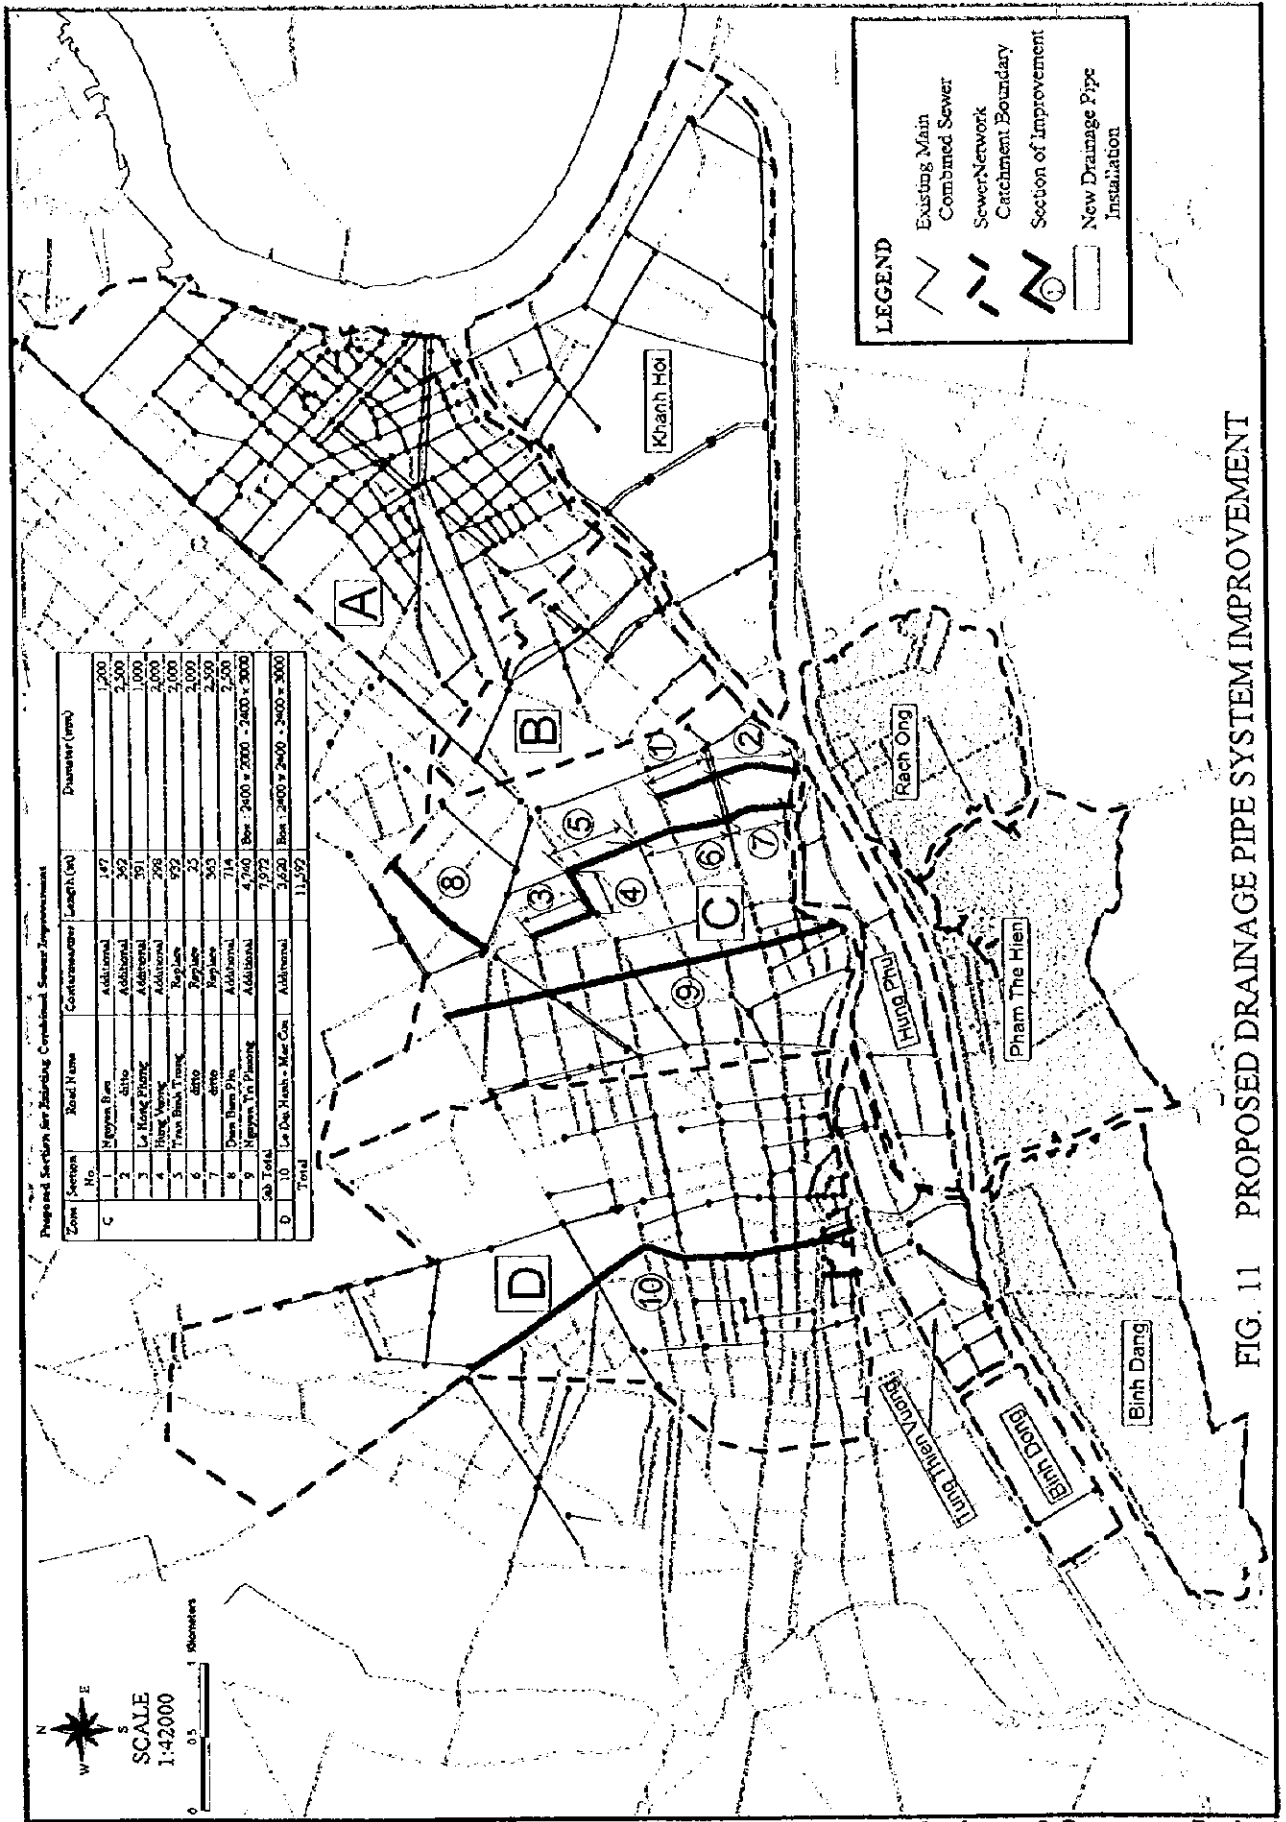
PROPOSED DRAINAGE PIPE SYSTEM IMPROVEMENT
